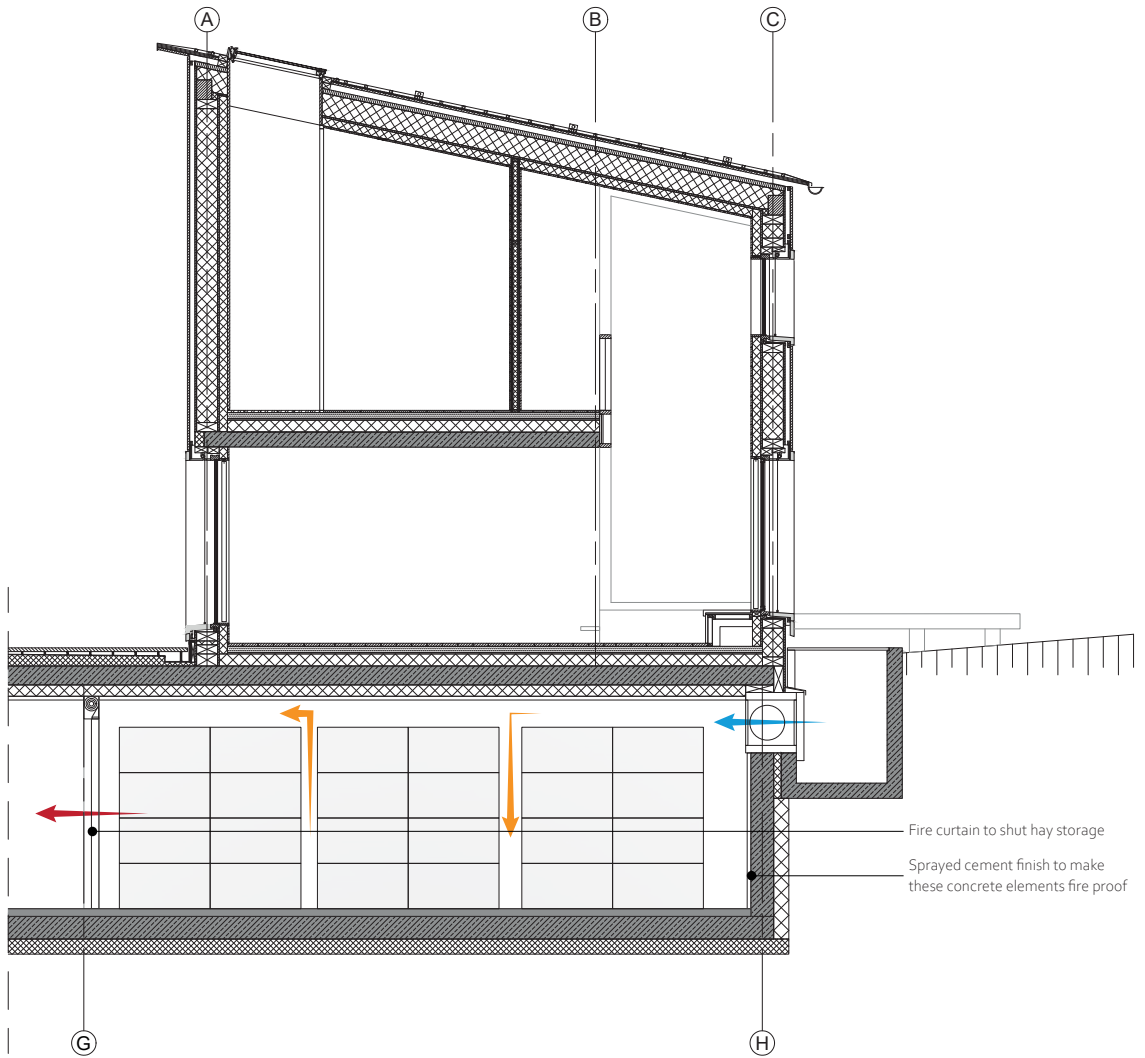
Section hay storage with air circulation and fire proof materials, 1:100
